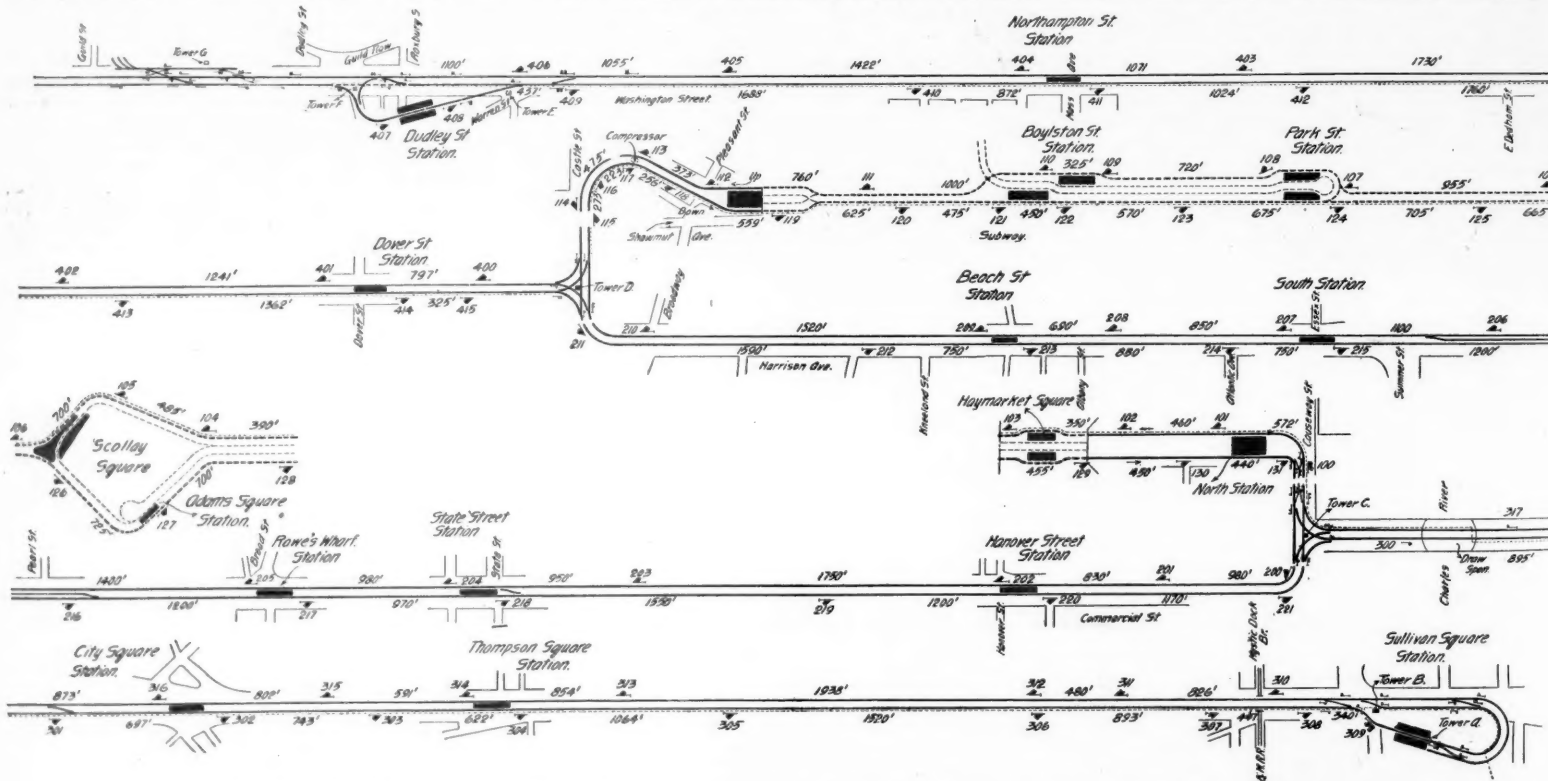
Signaling of the Boston Elevated Railroad from Tower G (Dudley Street) to Towers A and B, Sullivan Square, Charlestown.
